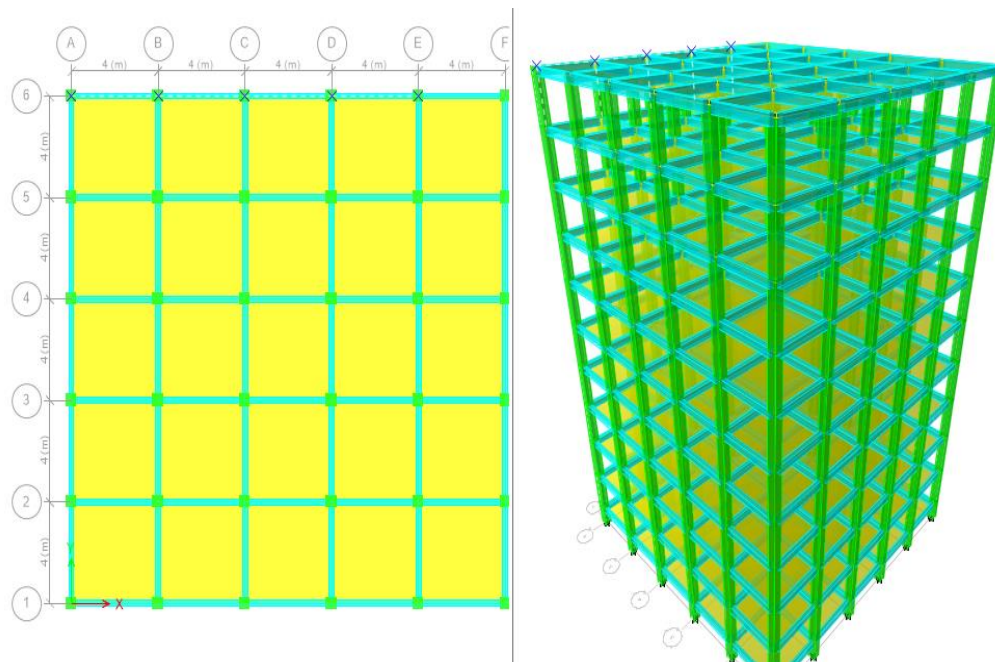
Plan and 3D view of Symmetric Bare frame
